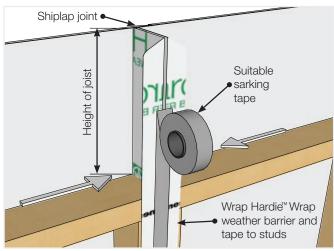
VERTICAL JOINT OF WALL MODULES
